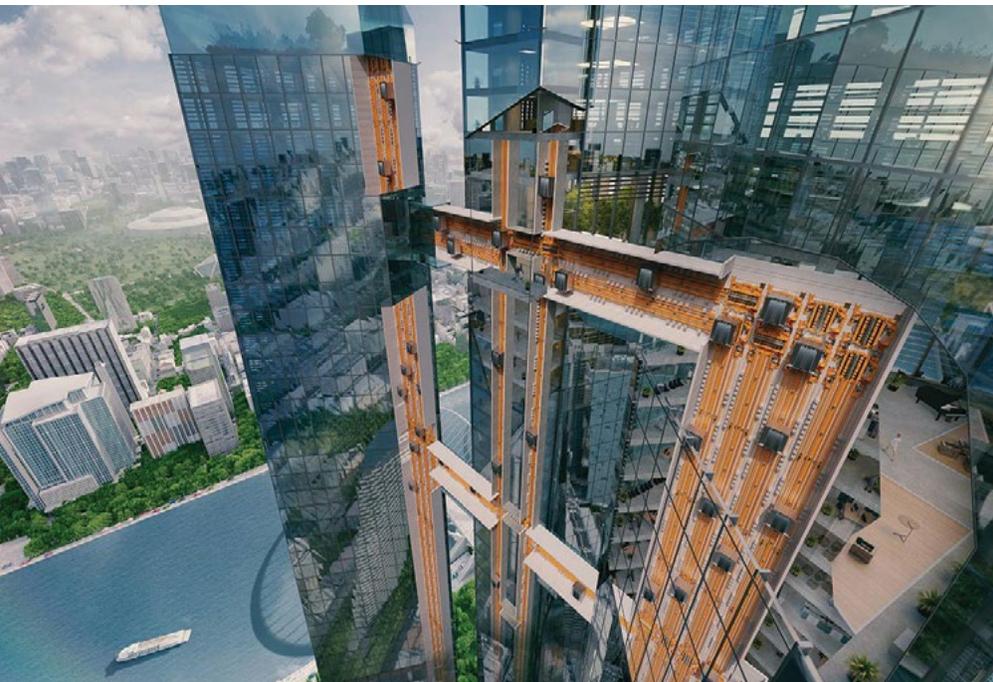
MULTI is a ropeless, multi-directional elevator system that could change the nature of how tall buildings are connected. © thyssenkrupp Elevator
